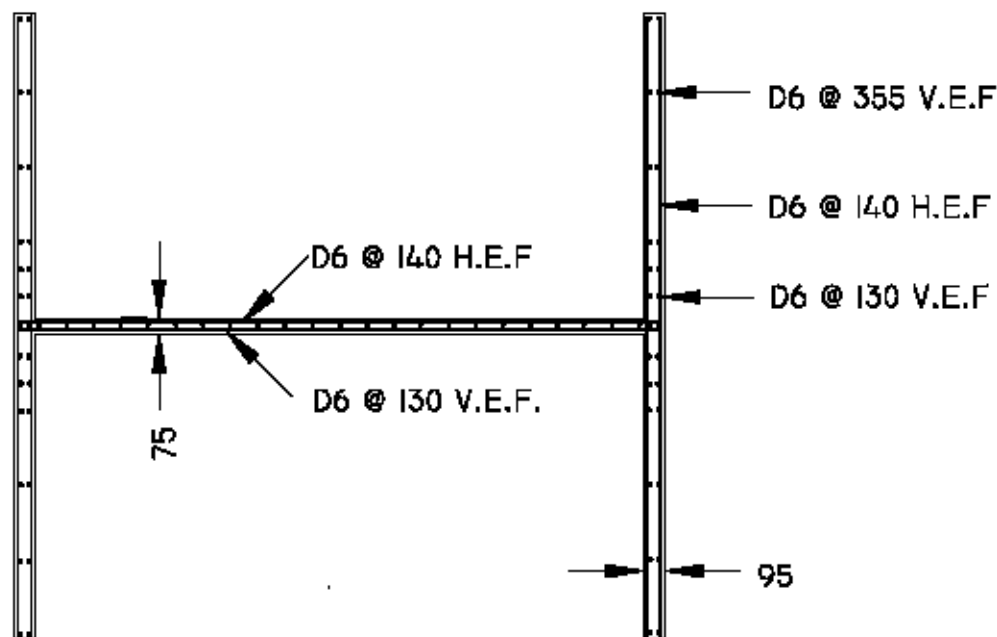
Wall DP1 before testing [Palermo and Vecchio (2002a)]
